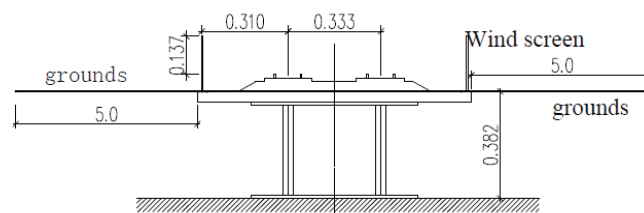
Wind tunnel test model of ground roadbed (unit: m)
